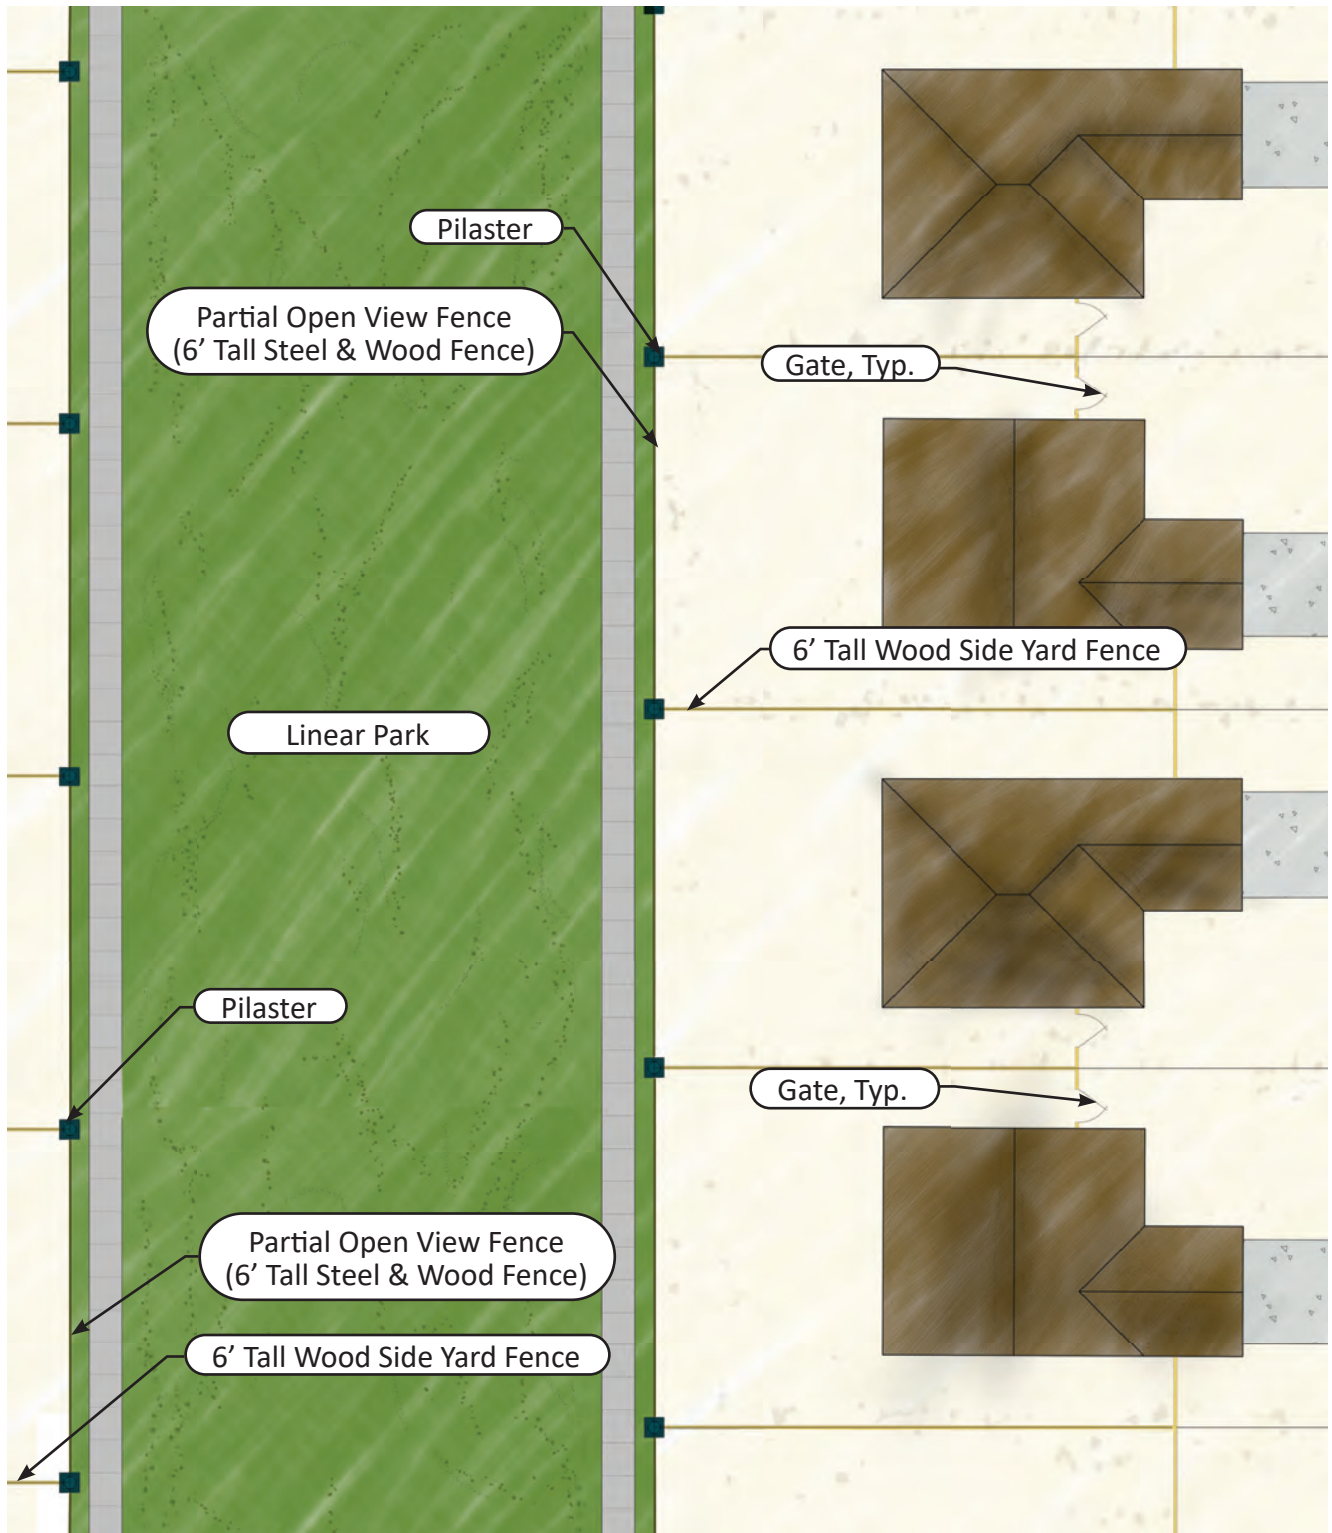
TYPICAL LINEAR PARK FRONTAGE FENCING LAYOUT
